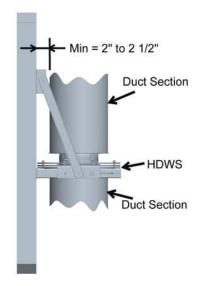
Heavy Duty Wall Support MINIMUM CLEARANCE
